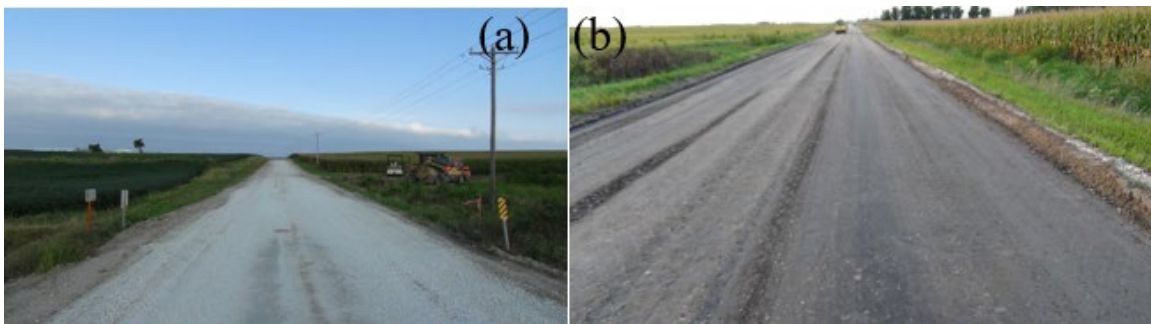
EMC SQUARED sections at end of construction: (a) Washington and (b) Hamilton County
